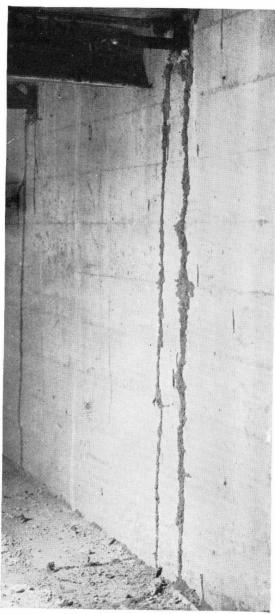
Termite shelter tubes extending down over poured concrete wall, connecting wood and ground. Form boards left in place around openings for pipes attracted termites from the soil outside the foundation.
